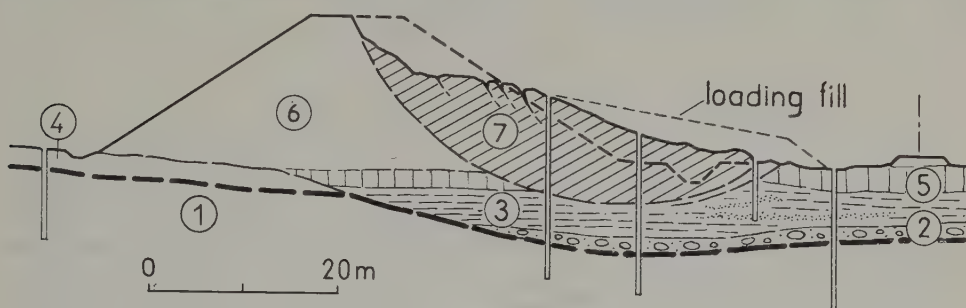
Collapse of a railway embankment near Podlešín, Bohemia; 1 — argillites and sandstones, Permian, 2 — sandy gravel, 3 — clayey-sandy alluvium, 4 — loess loam, 5 — alluvial loam, 6 — embankment, 7 — slipped mass.
